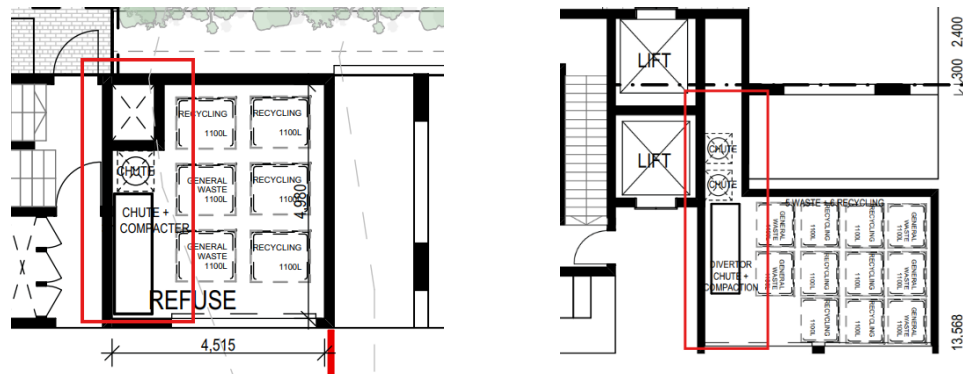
Bin store - O'Connell Street Tower (Left) and Browning Street Tower (Right)
